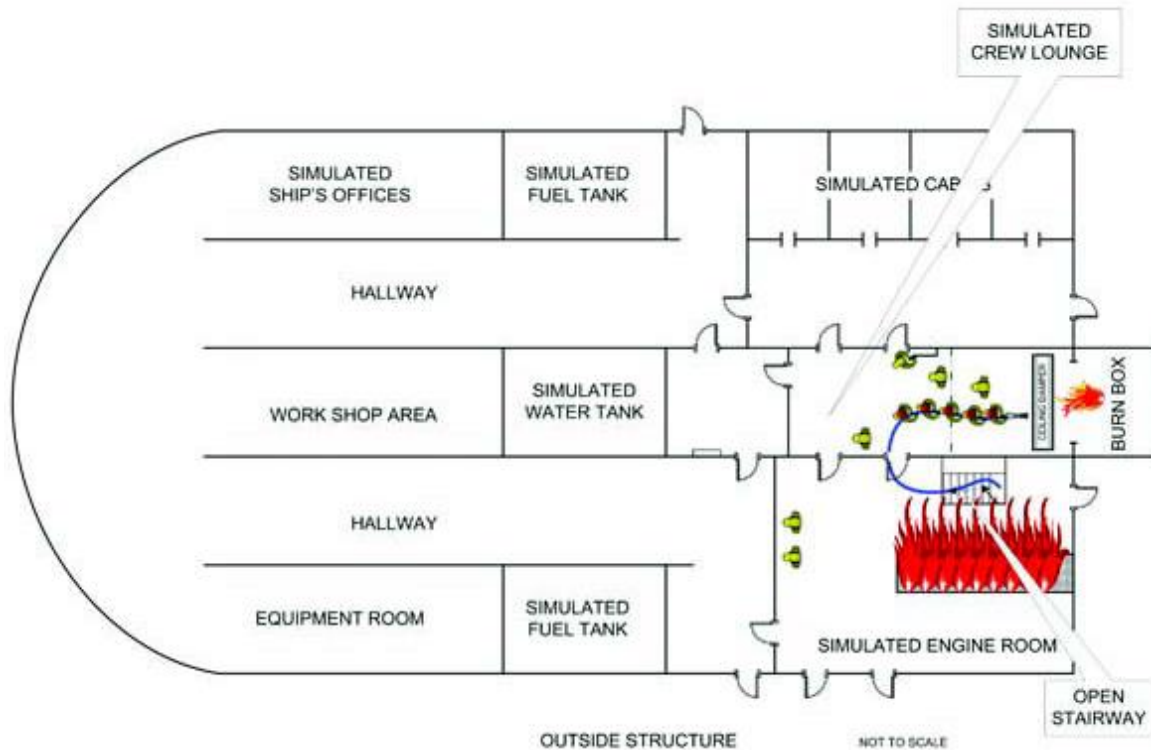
Schematic layout of the ground floor of a live fire burn structure (Source: Lawrence, 2008)
